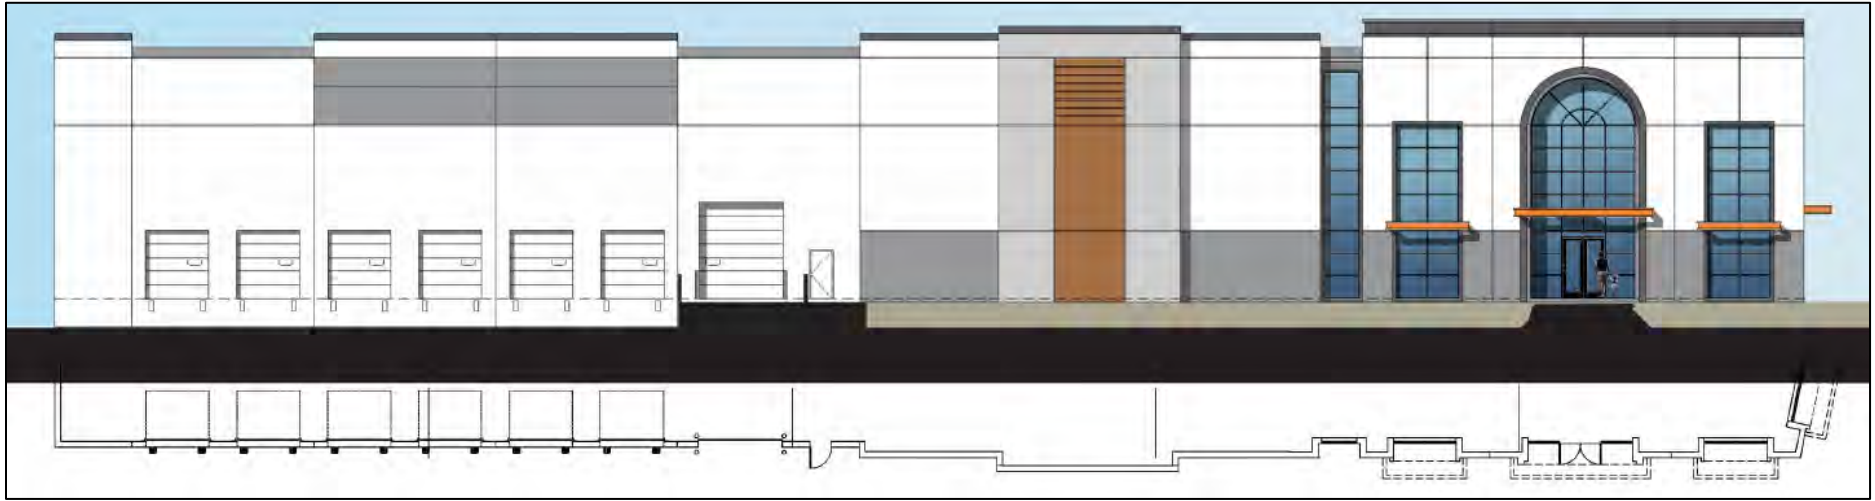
INDUSTRIAL EXTERIOR ELEVATIONS (BUILDING 1)
